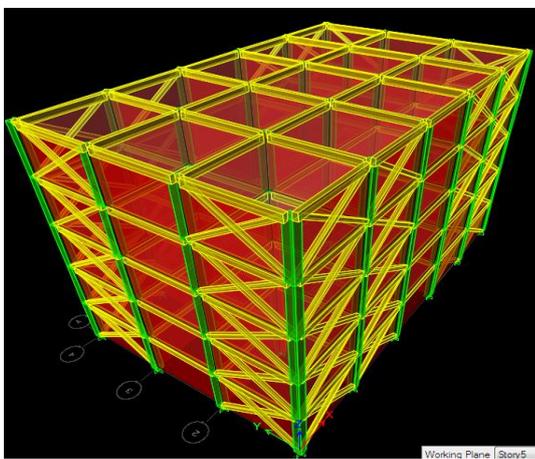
Frame with wall element and bracings at corner bays (Case 2)
